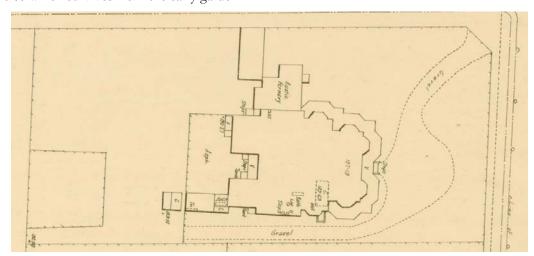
MMBW detail plan no. 1793, dated 1902 (source: SLV).
